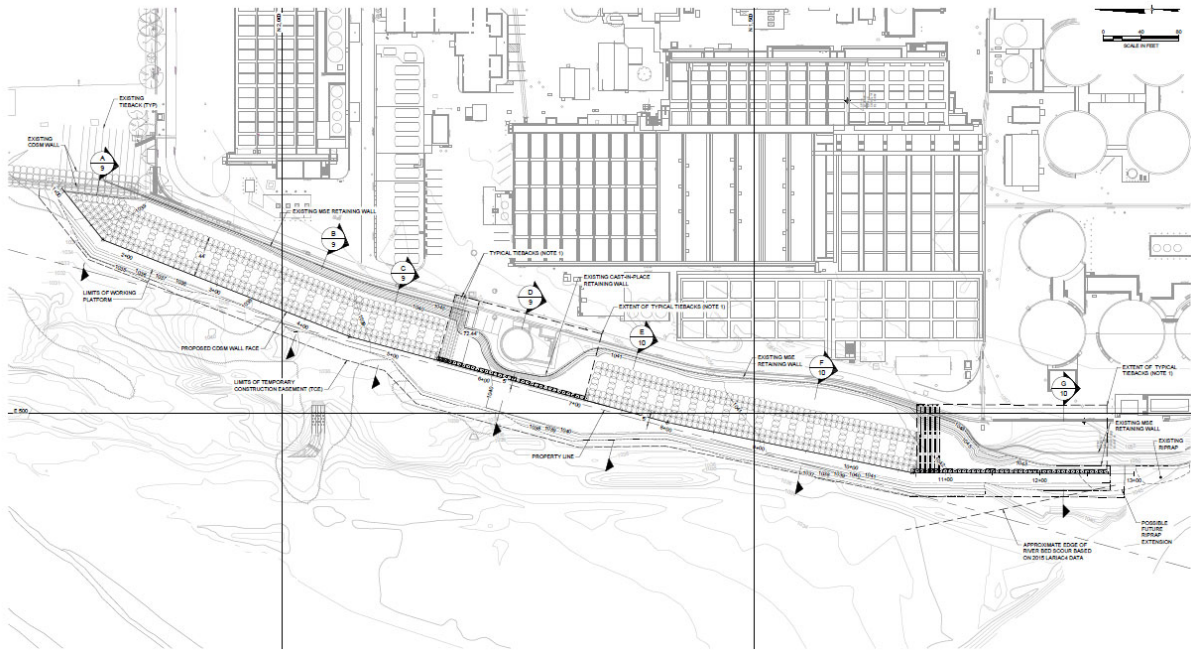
Option 1 – CDSM Gravity Type Structure Layout
